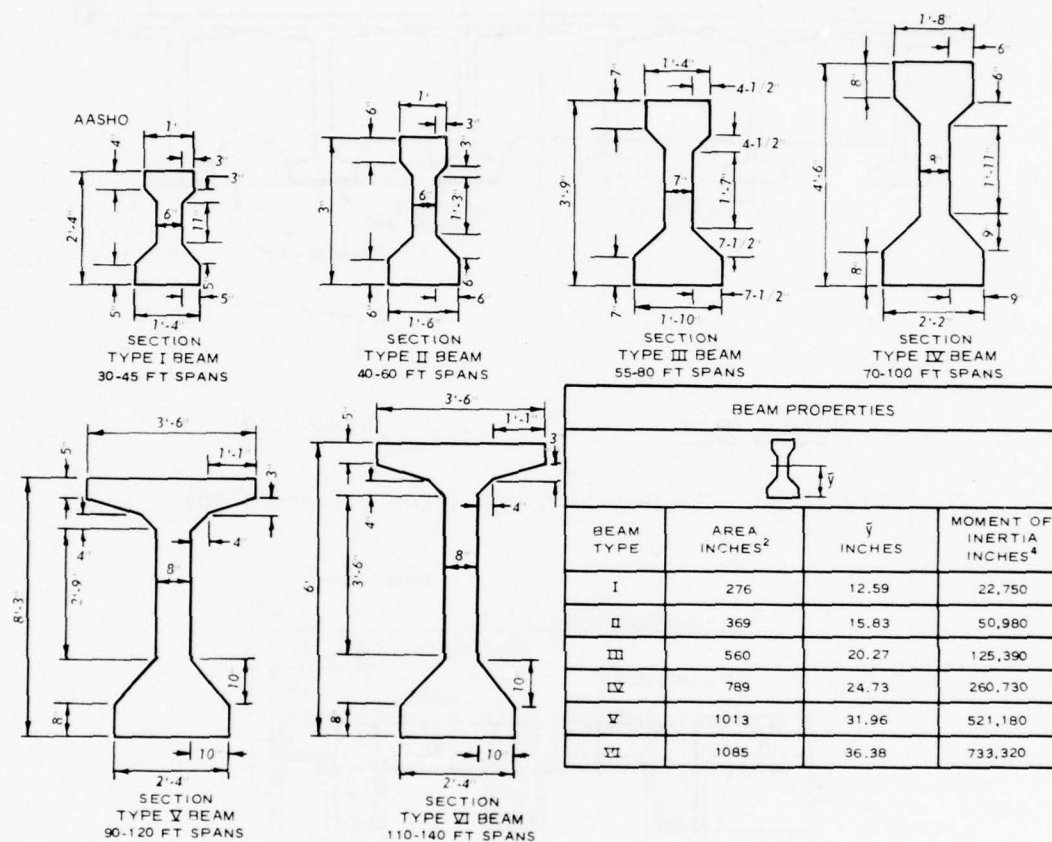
Dimensions and section properties for AASHTO standard bridge beams (from Reference 17)
